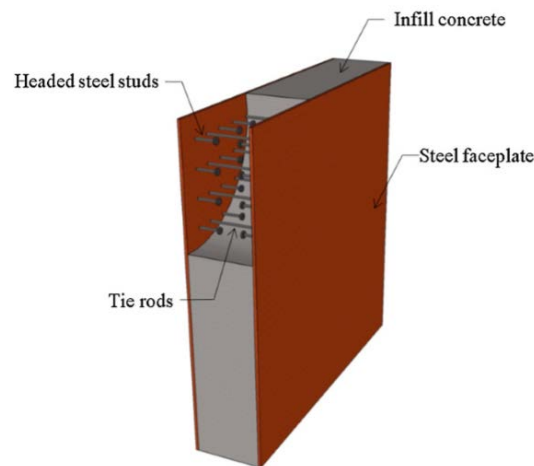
Typical cross section of concrete filled steel plate shear walls (Epackachi et al. 2015a[10])
